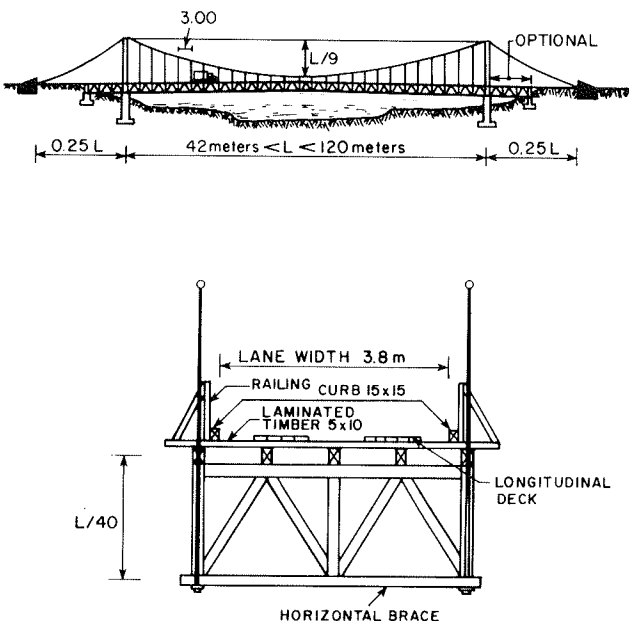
Single-span bridge with timber deck and timber-stiffening trusses.
